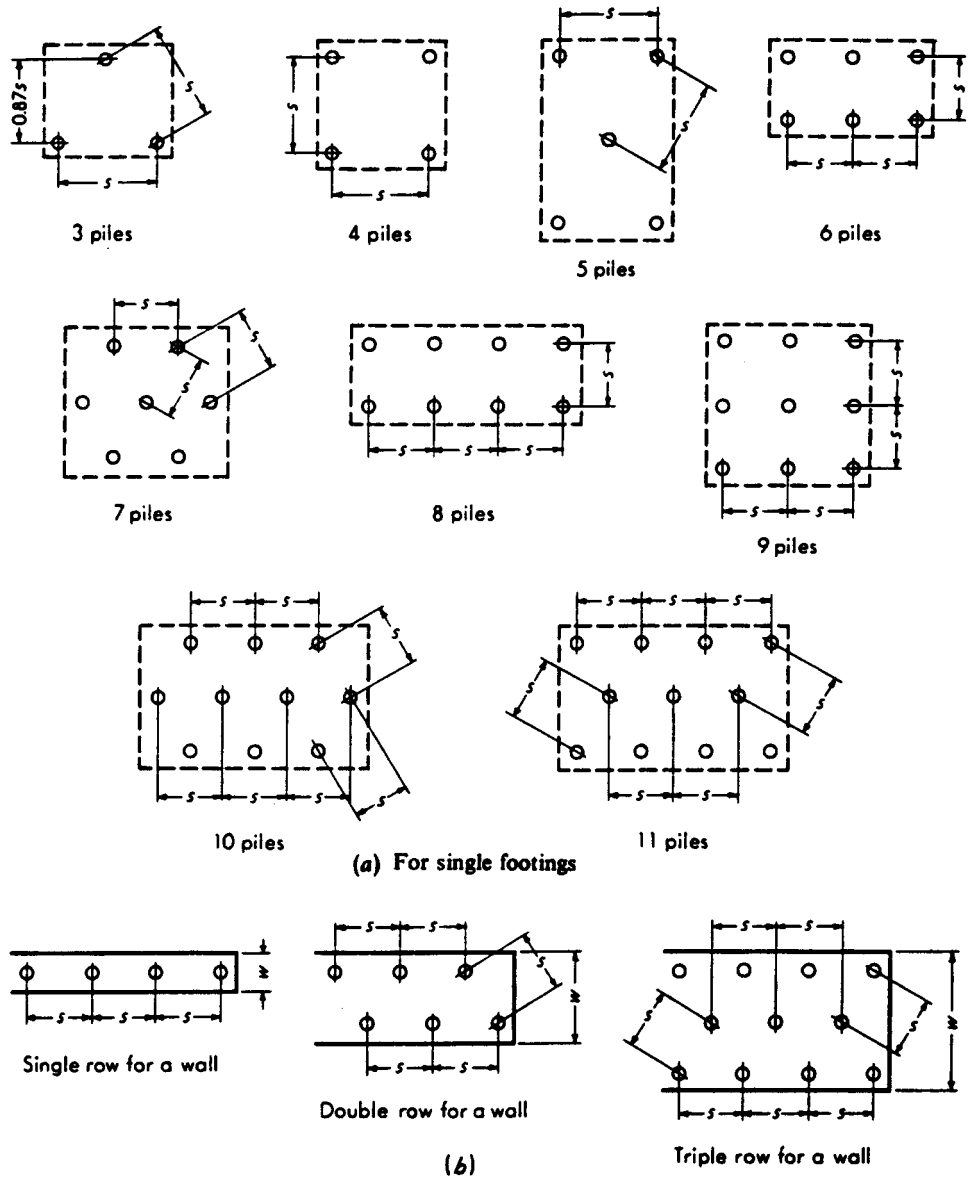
C.10 Typical pile group patterns. (a) Single footings. (b) Foundation walls. (From Bowles, 1982.)
